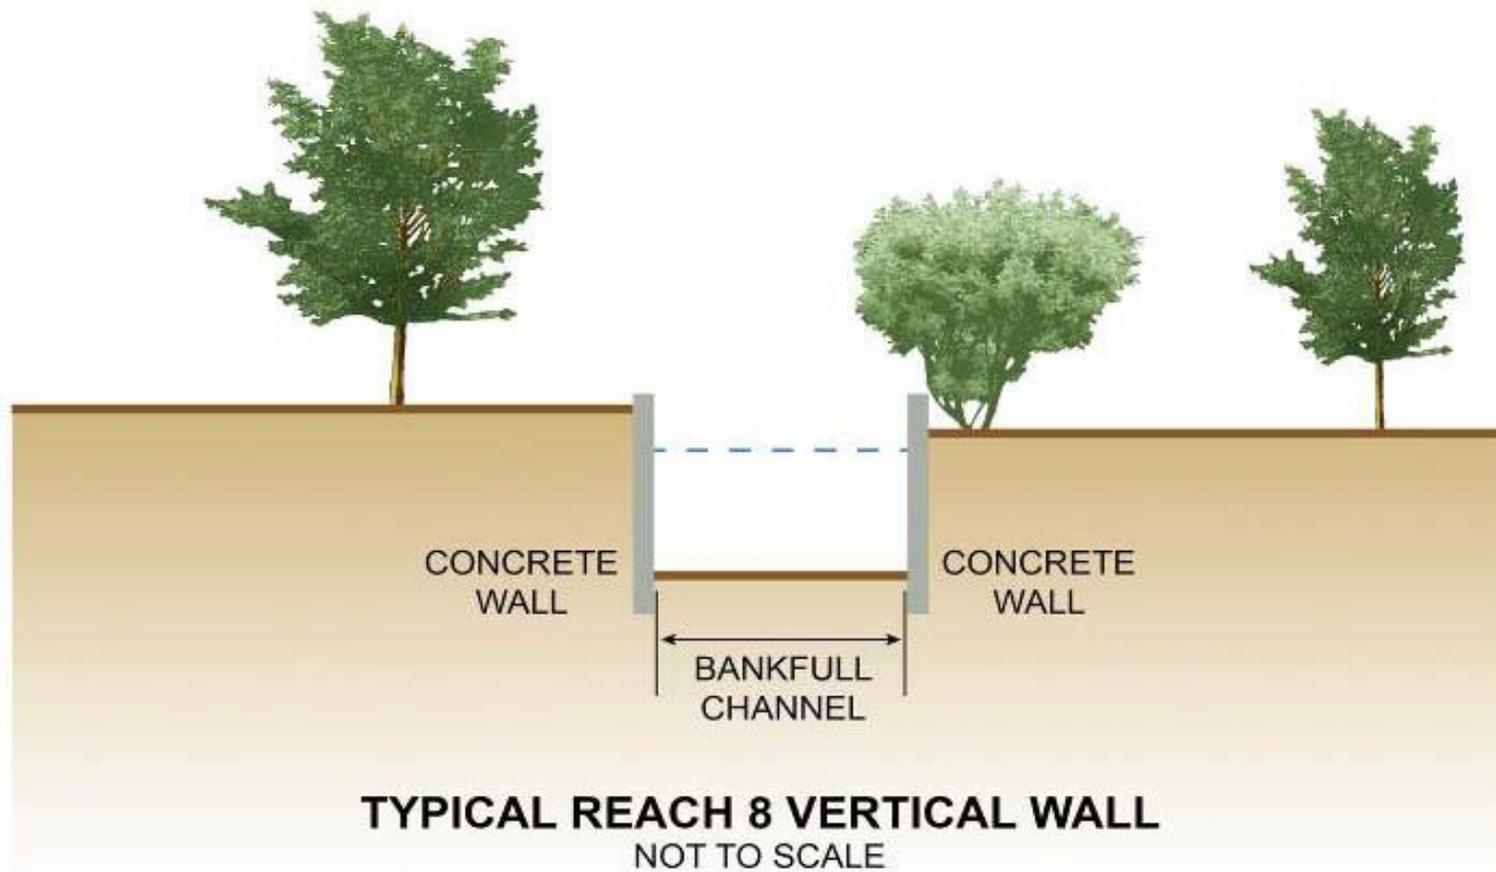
Reach 8 Channel with Vertical Concrete Wall
